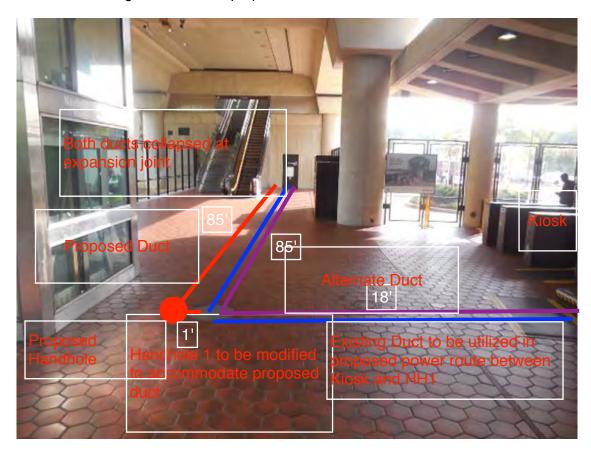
Existing, alternate and proposed ducts in back room corridor.
